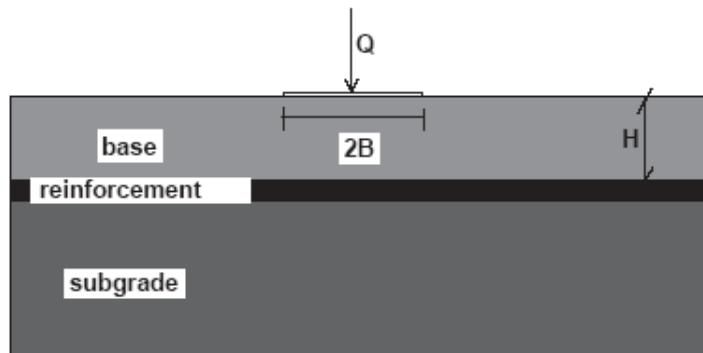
Typical cross-section of two-layer subgrade reinforced with geosynthetics
